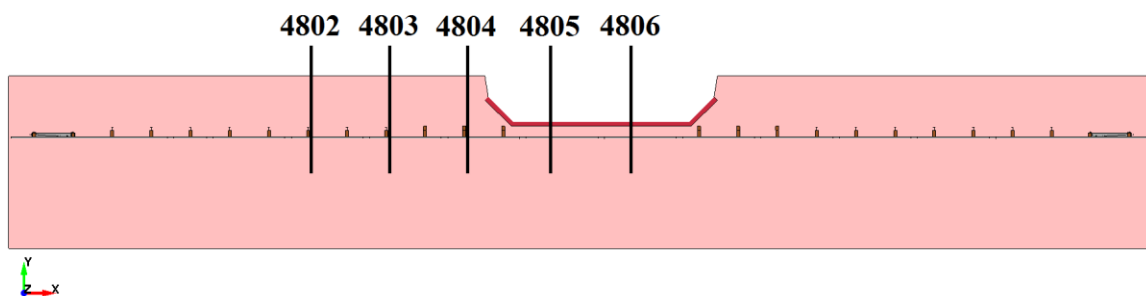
Cross Sections: Maximum Forces through Guardrail – Increased Span Lengths
